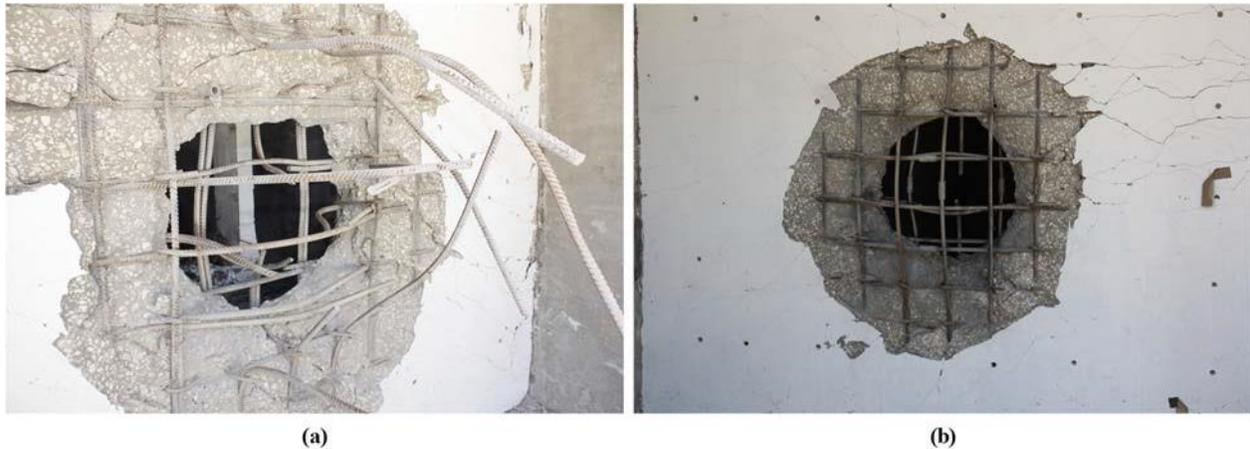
Reinforcement details post Test 3; (a) Baseline RC wall; (b) Test RC wall
